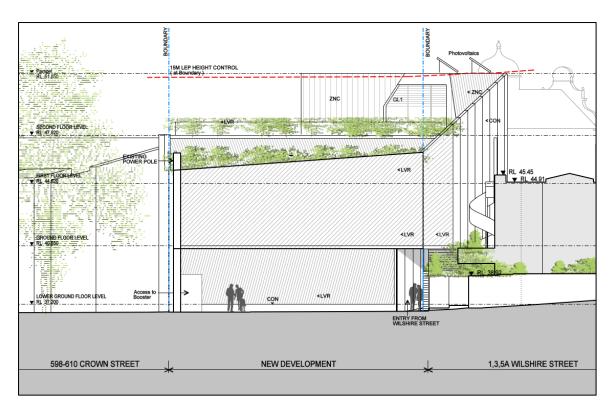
Rear elevation of the approved development at 594-596 Crown St (D/2018/1534)
